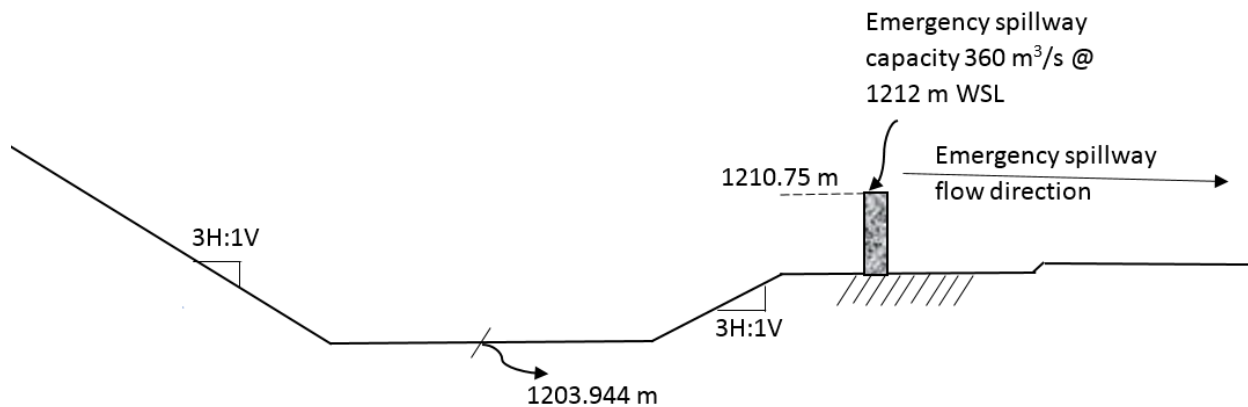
Diversion Channel cross section at station 13+400 looking downstream towards the Storage Dam (not drawn to scale)
